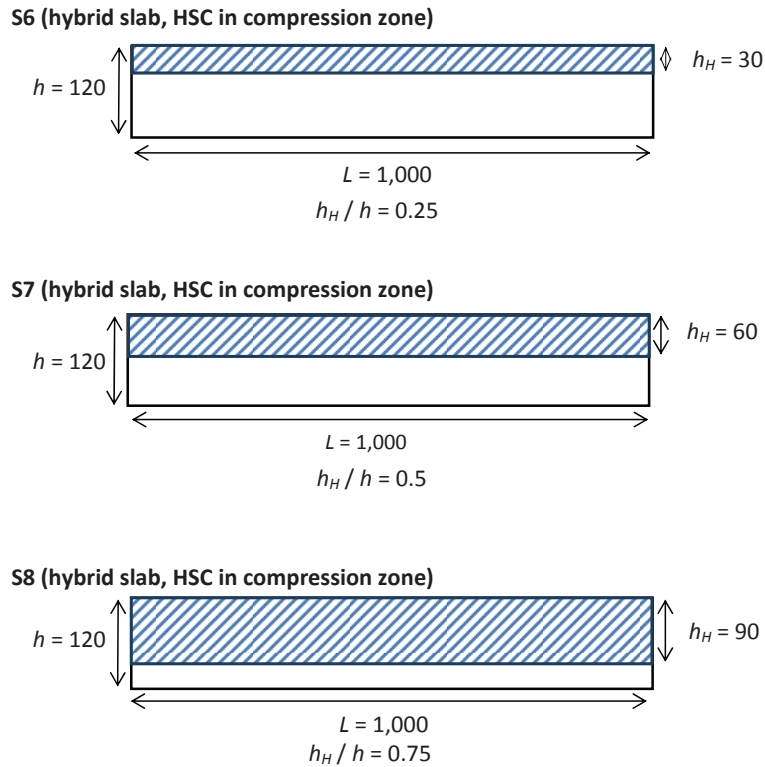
Type of the tested flat slab specimens (all dimensions are in mm)
